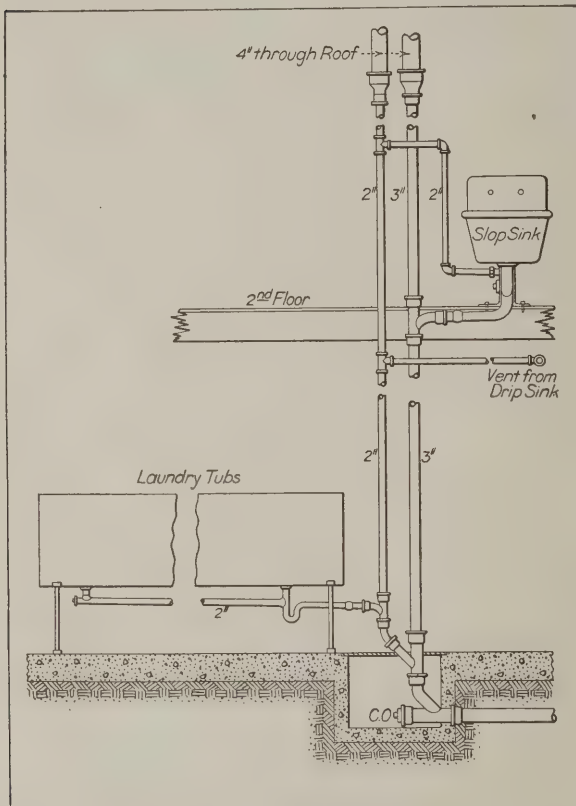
Stack No. 6 Serving Laundry and Slop Sink
